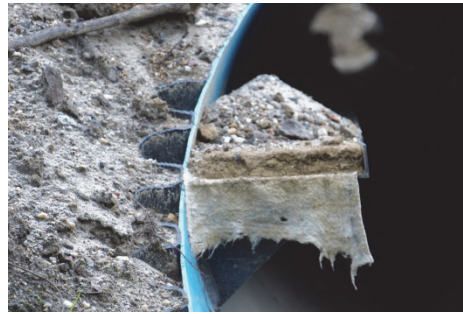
Example of shelves for animals with inadequate width. Damage of the geotextile reinforcement of its surface
